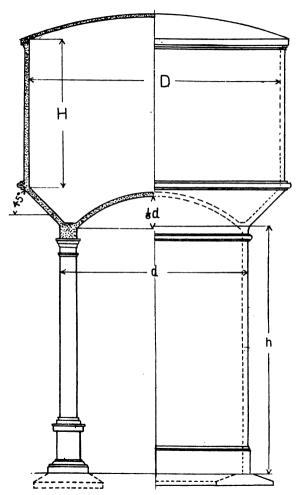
Half Section and Half Elevation of Elevated . Water Tanks.
